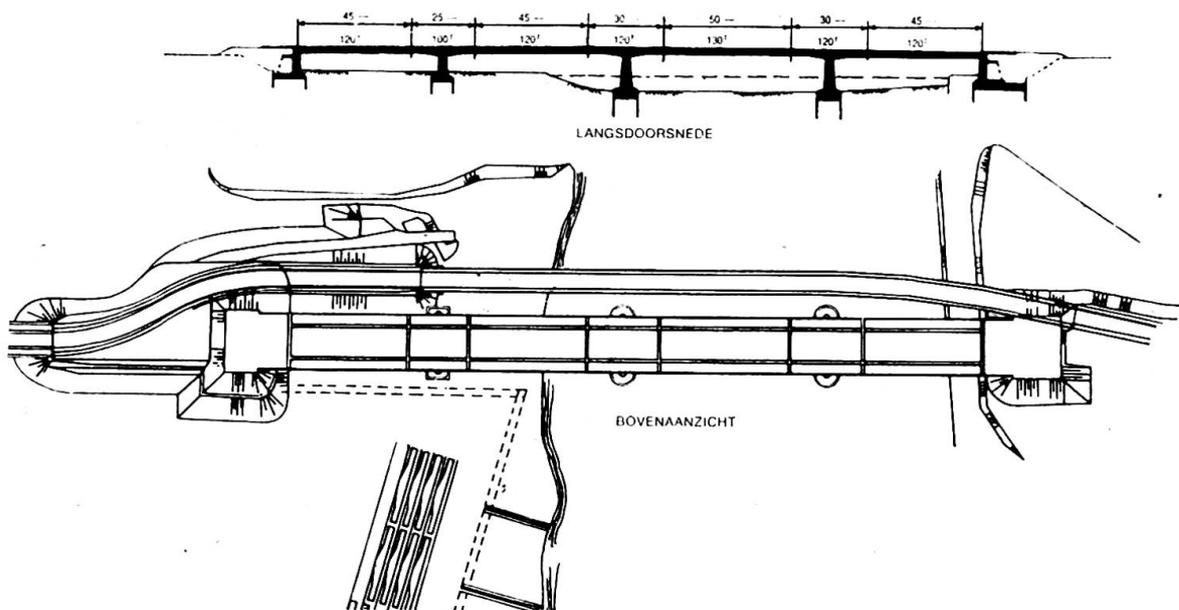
Longitudinal section and ground plan of the bridge over the river Meuse at Roermond.
